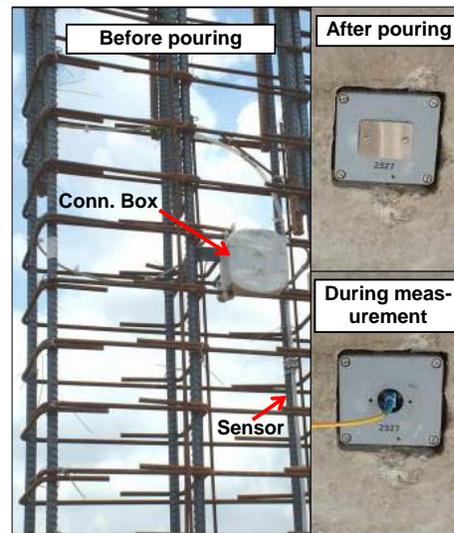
Sensor and connection box installed on a rebar cage, and connection box after the pouring of columns
